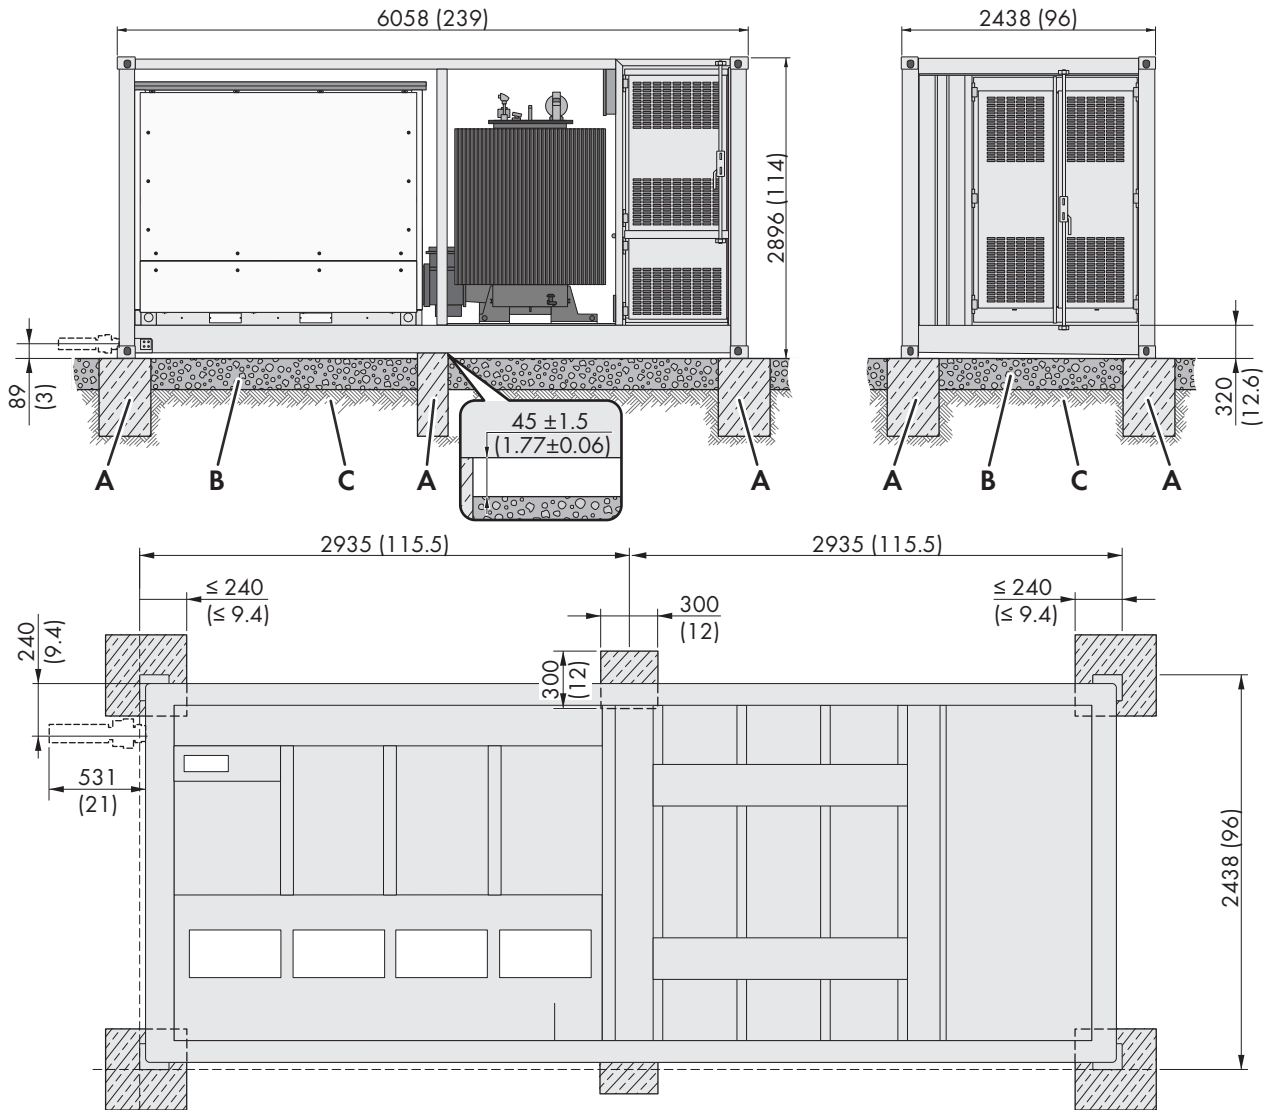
Mounting option with pile foundation (Dimensions in mm (in))
